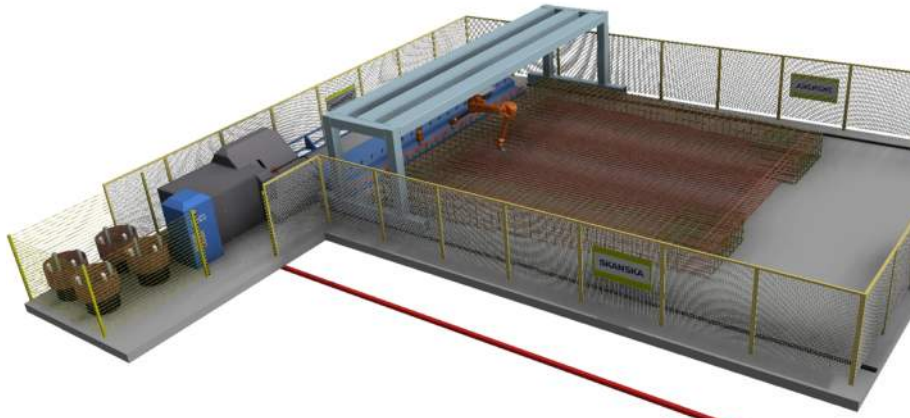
Schematic view of an intended reinforcement unit construction station.
